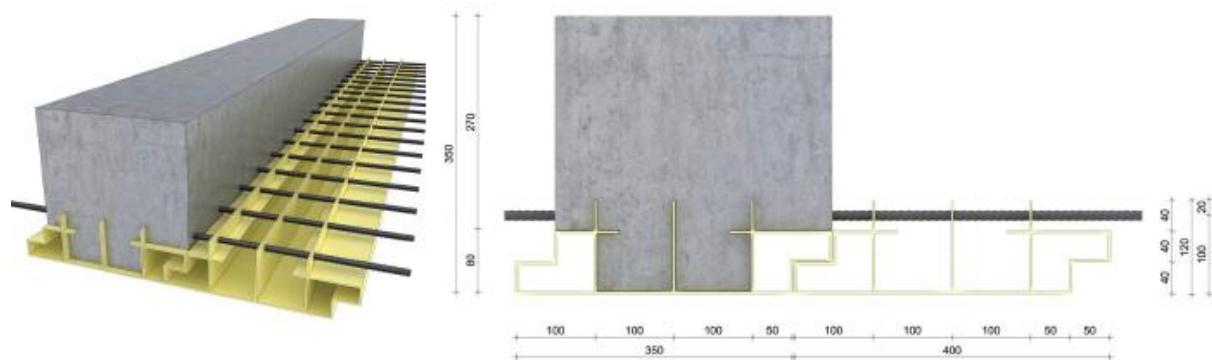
Trans-IND design deck and section view (Warszawa 2009)
